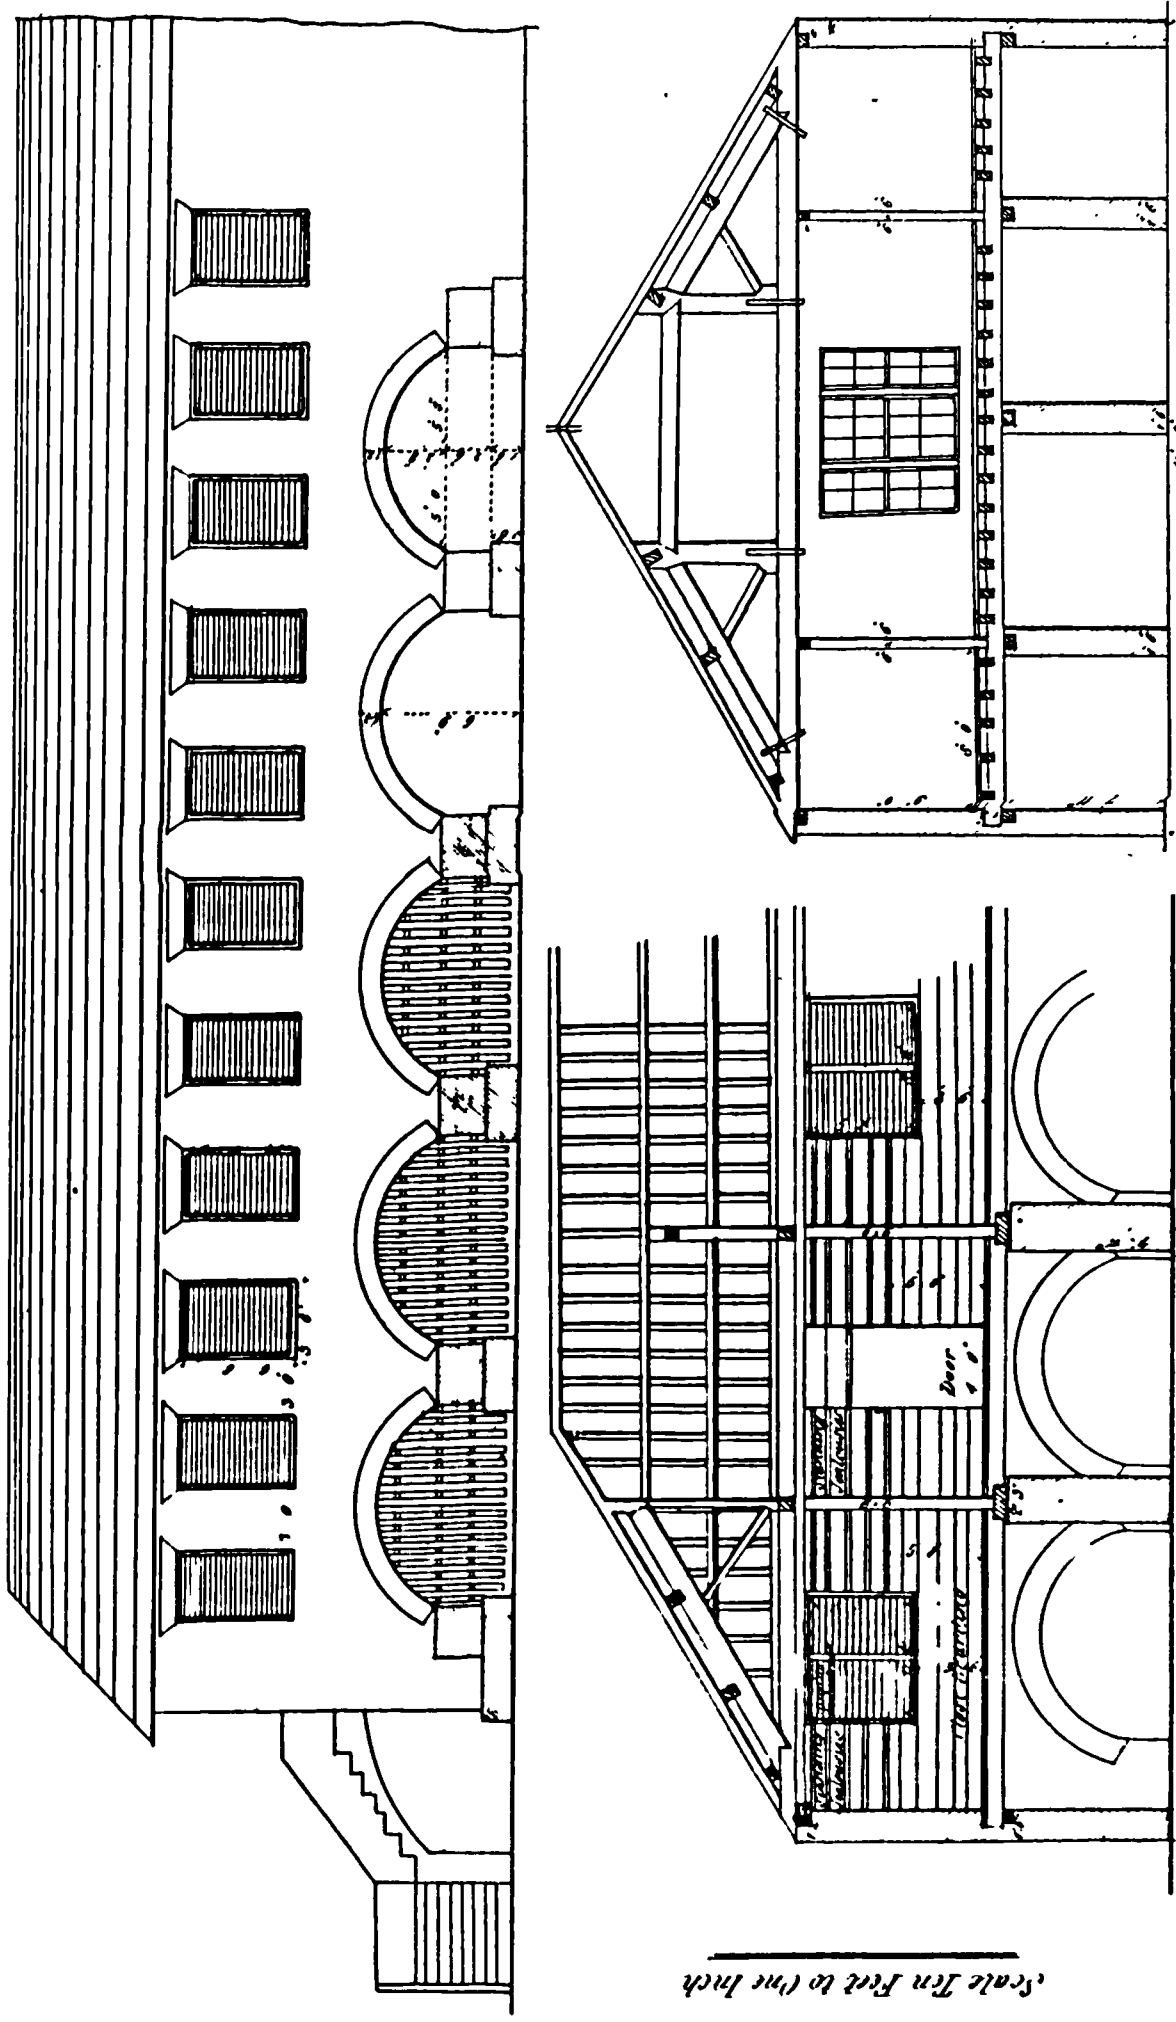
Captain West's Barracks at Lucea, Jamaica : Elevation and Sections
